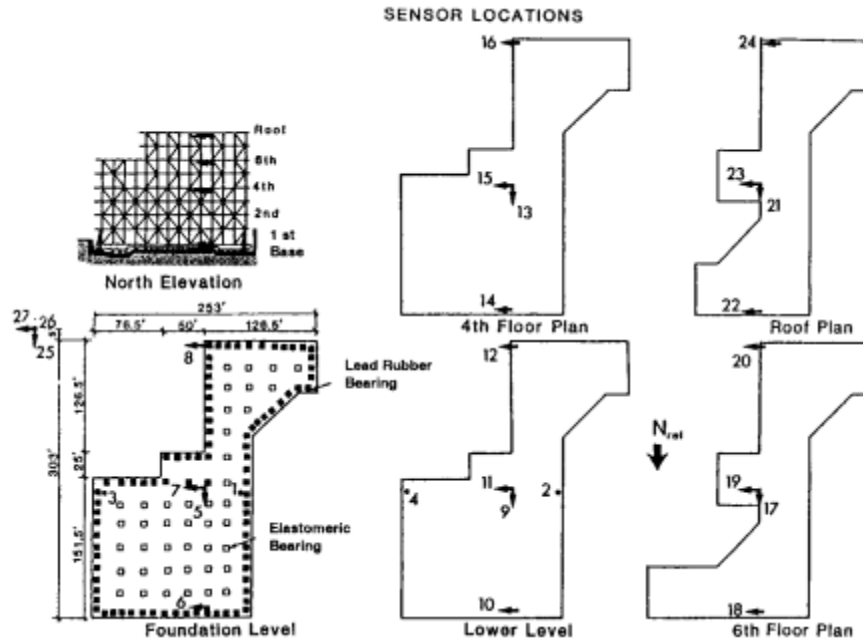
USC Hospital Elevation, Plan Views, Isolator Layout, and Sensor Locations (Nagarajaiah & Sun, 2000)
